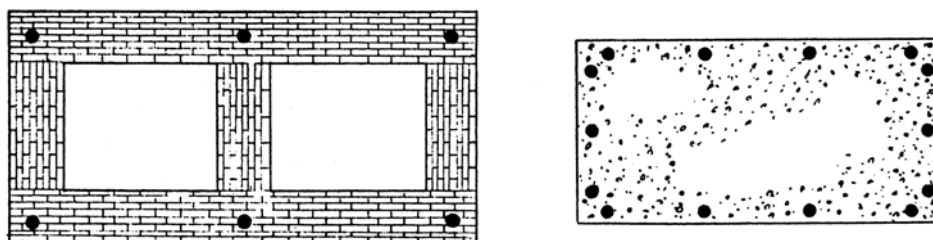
Typical foundations for a geared double-drum steam hoist. The foundation at left features wells for the cable drum. The foundation at right anchors a relatively small hoist. Twitty, *Riches to Rust*, 242.
